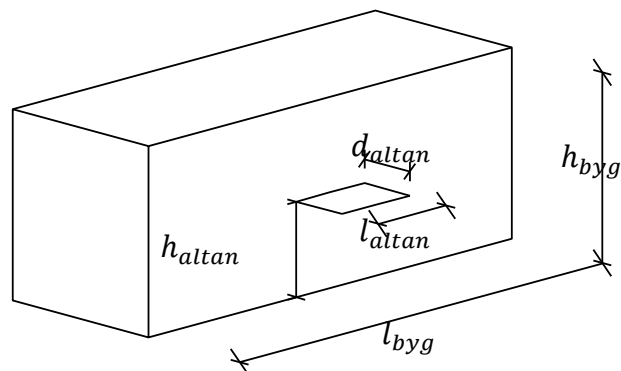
GL NA – Geometry of rectangular building with one balcony
